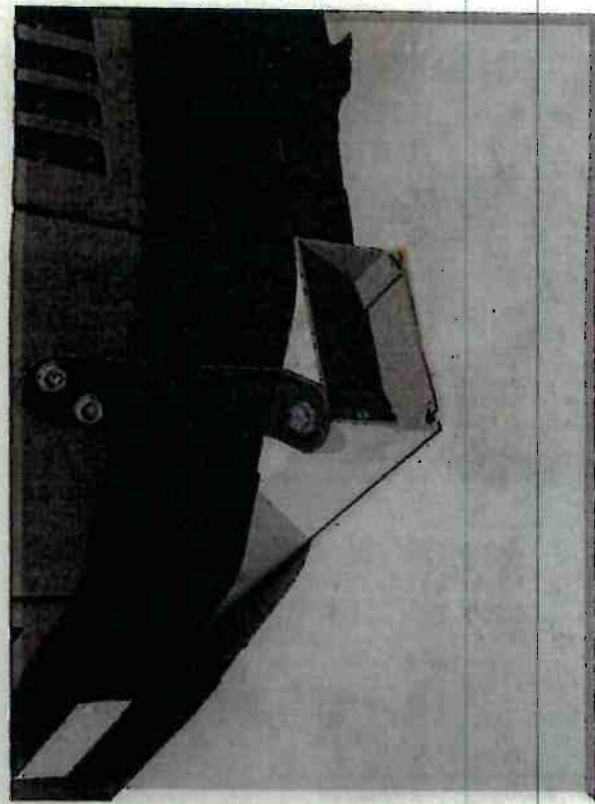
Compressors are anchored to runners, but runners are not anchored to the roof.
